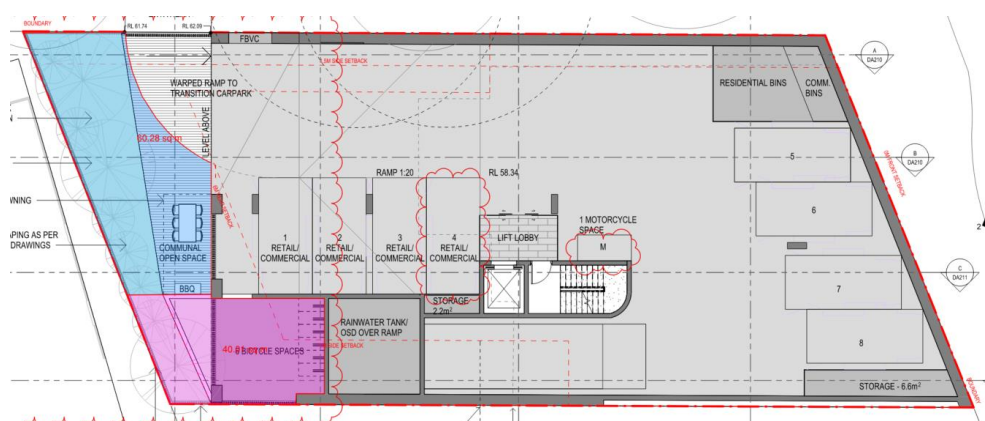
Proposed basement 1 floor plan with the additional communal open space shaded in pink - 18-20A Perouse Road, Randwick (Source: Curzon & Partners)
